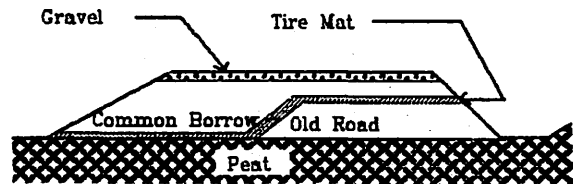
Cross-section of Hedbom Road tire mat installation.
